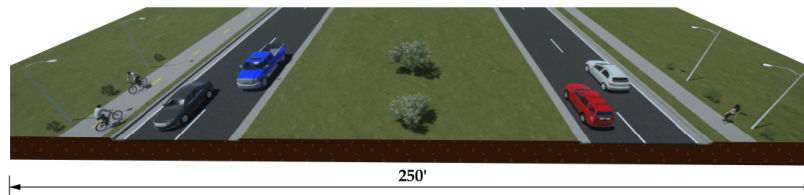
West Connector 250 feet ROW Typical Section from 3200' N of FM 1863 46 to SH 46
